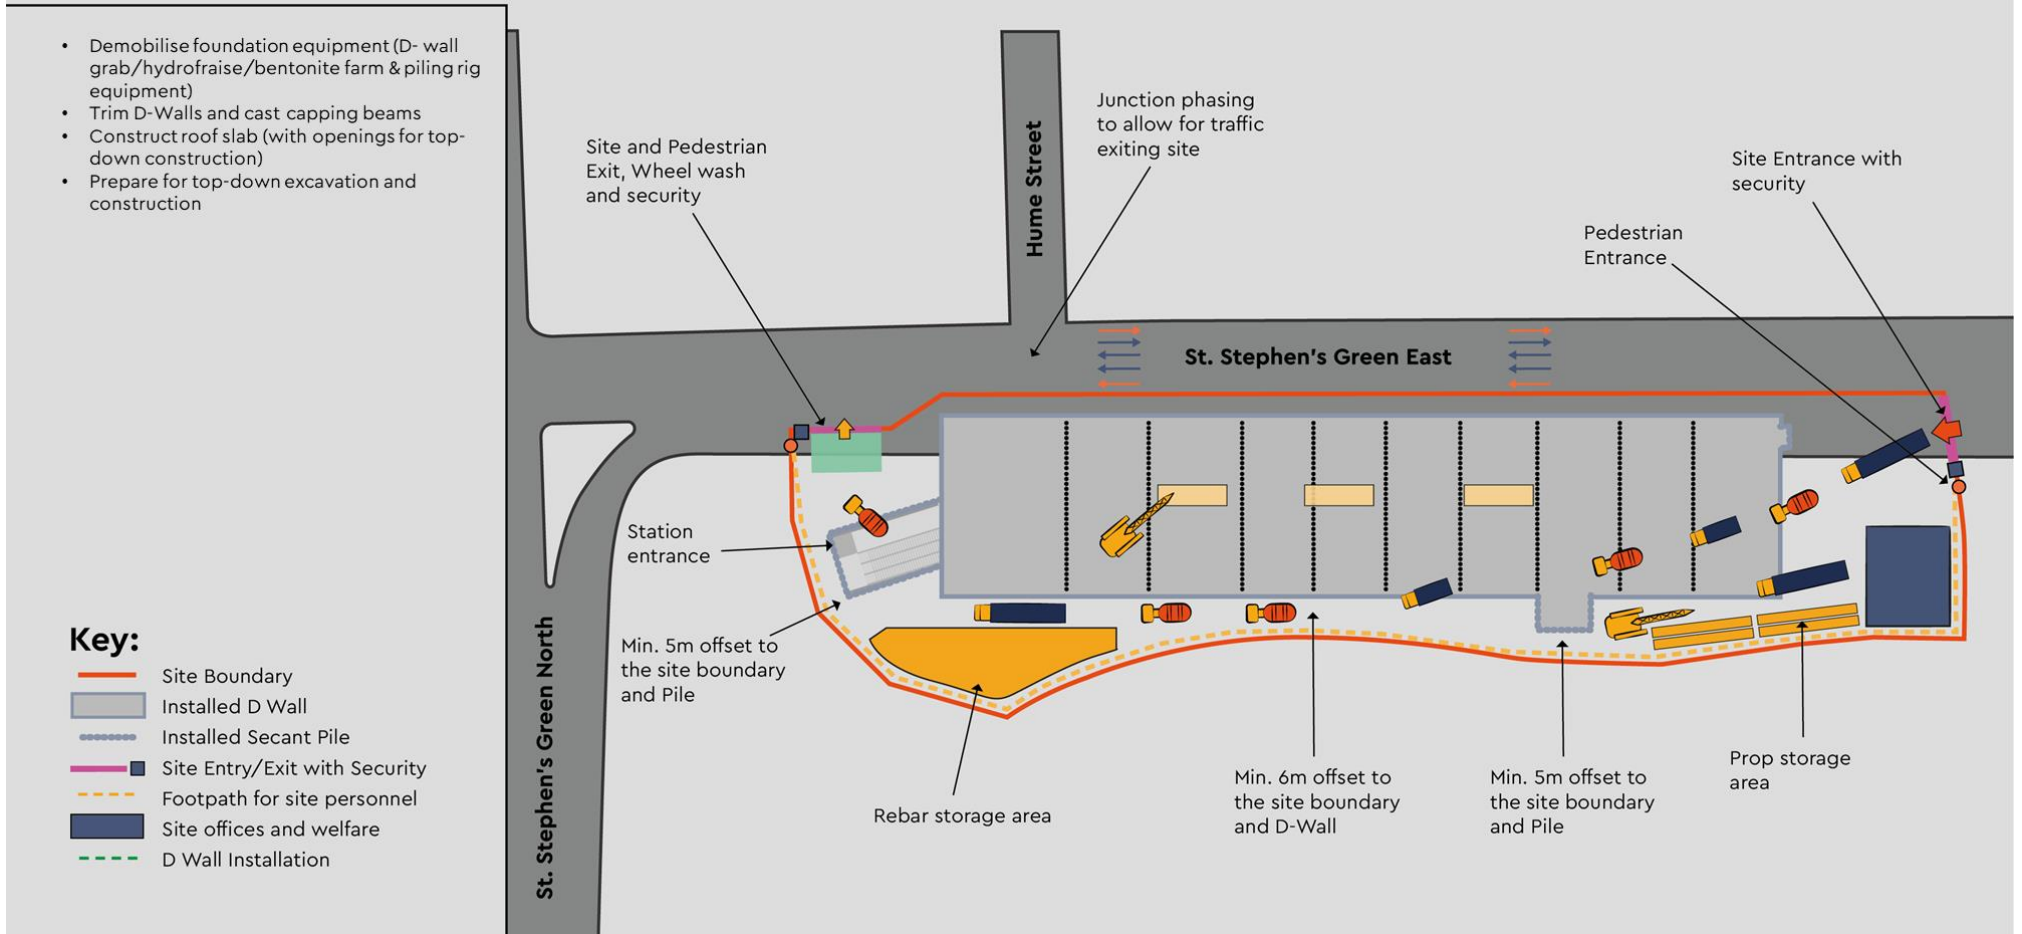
St Stephen's Green Stage 3 – Roof slab construction
